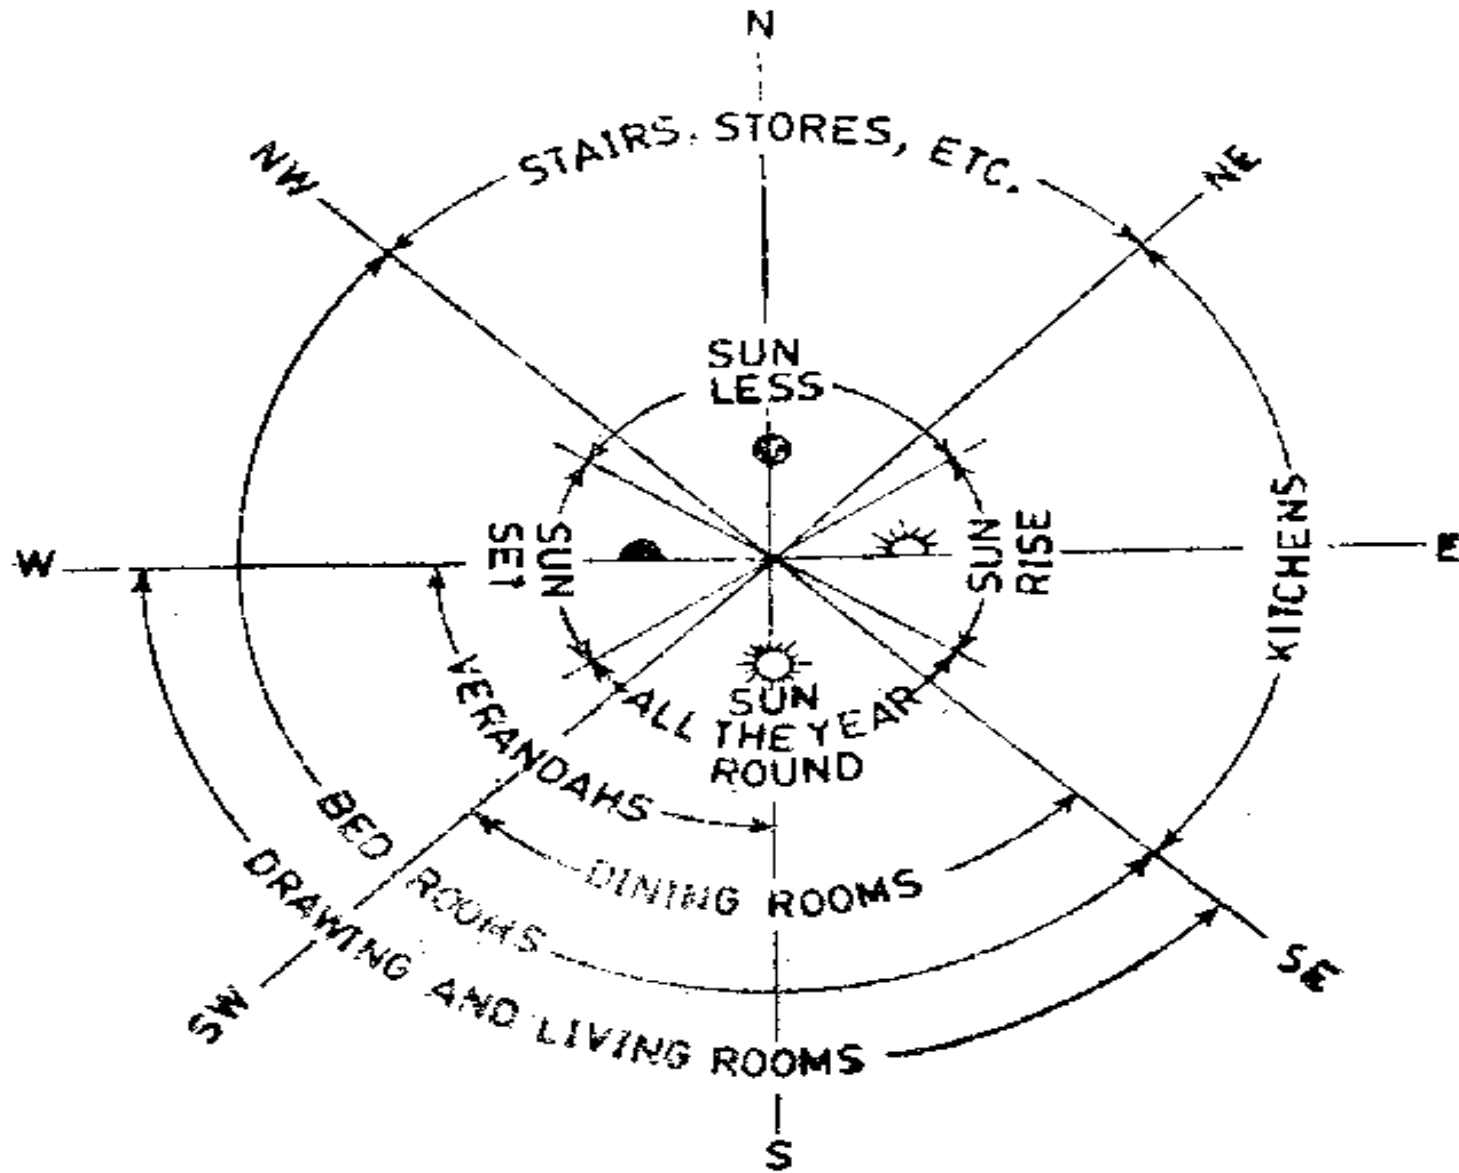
Method of placing Rooms of a Residential Building wr.t. the Direction of Sun.
